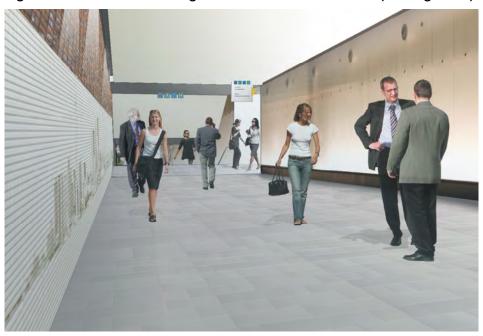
Artist's rendering of new PATH tunnel interior (looking south)
